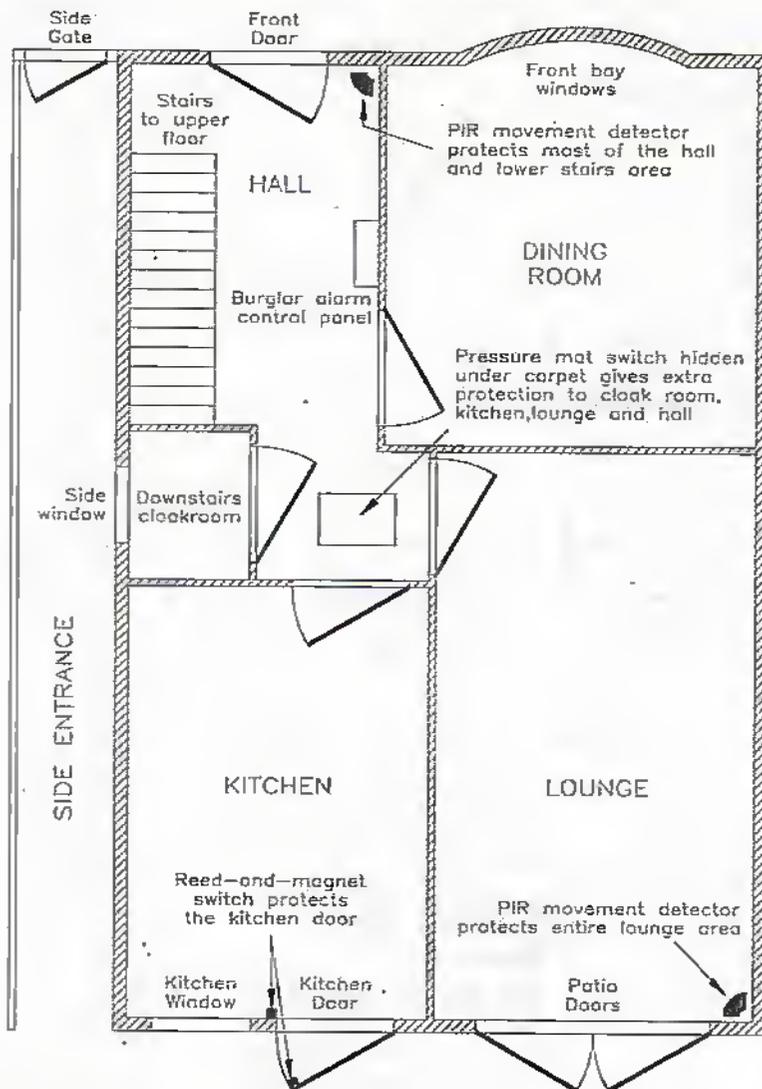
Ground floor plan of a semi-detached house, showing suitable positions for anti-burglary defences.
